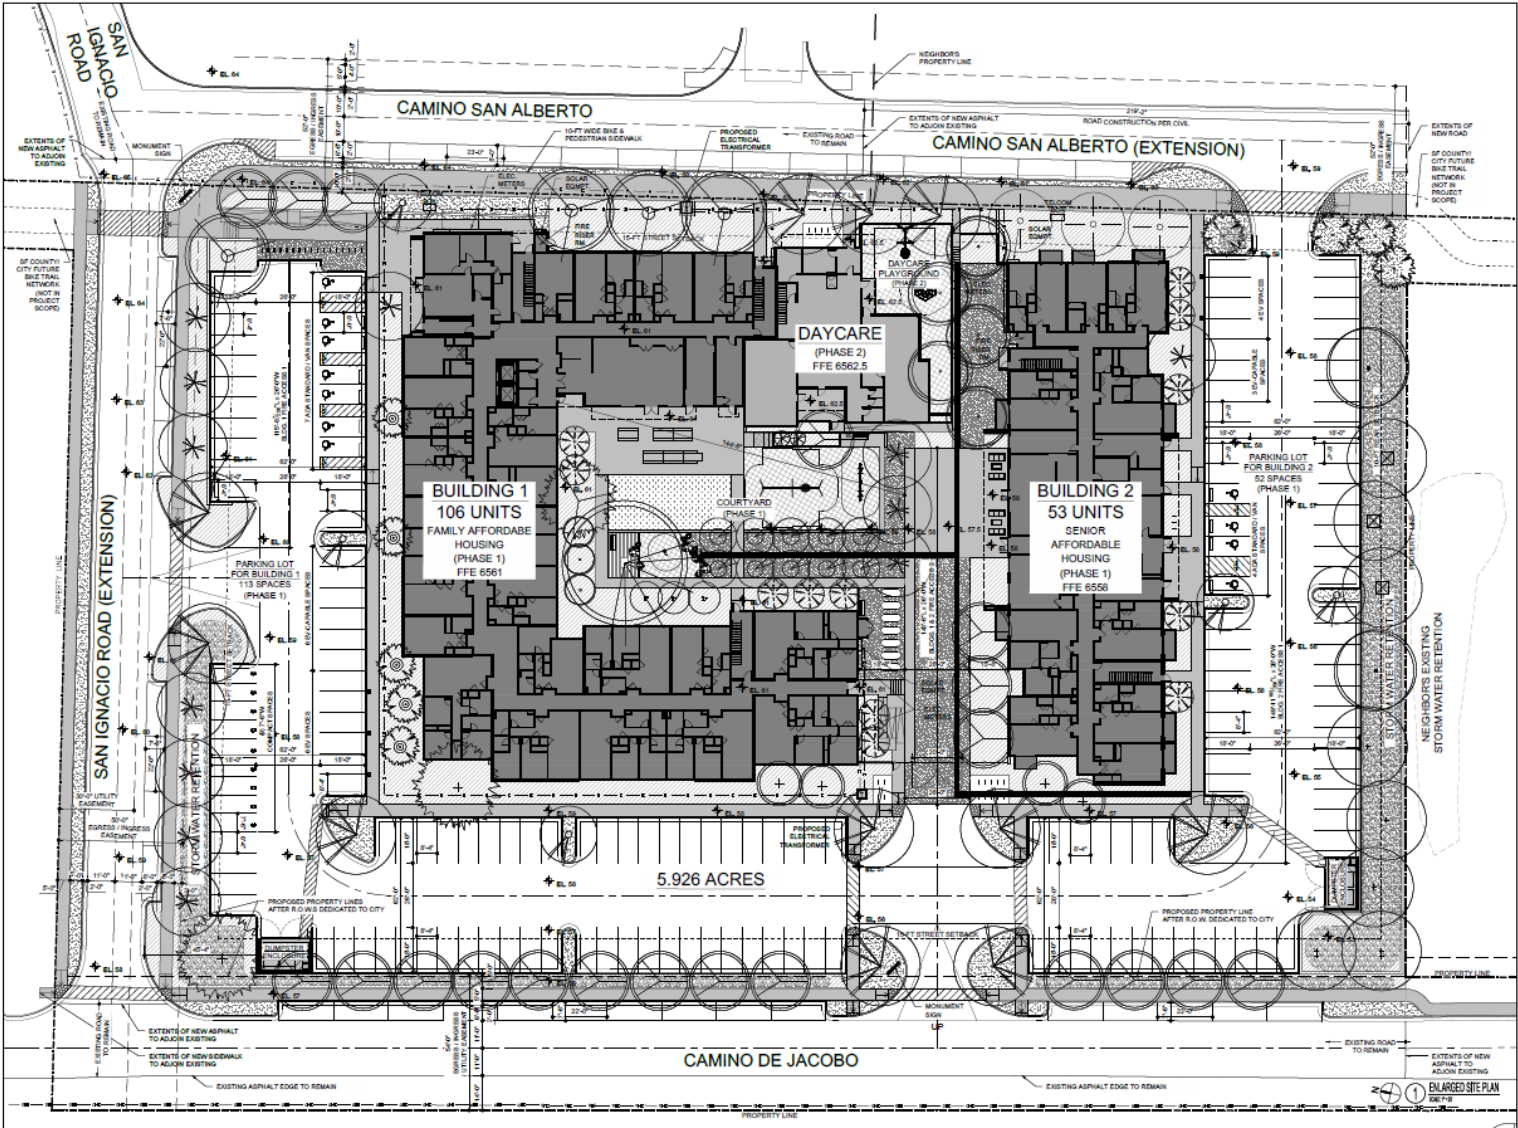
Nueva Acequia Site Plan, 09/29/2025, by Autotroph Design
